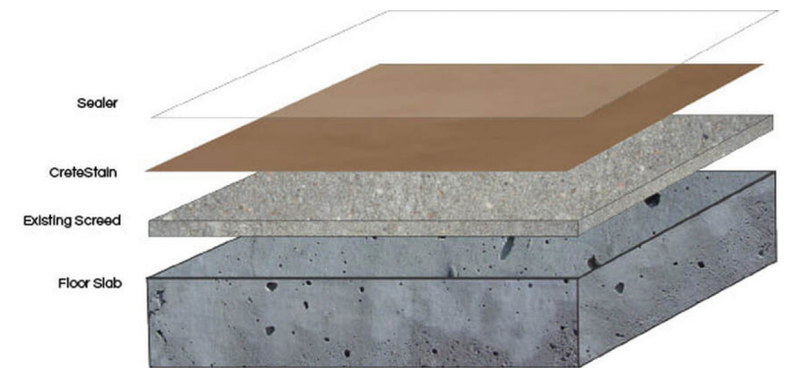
Cemcrete application (cemcrete.co.za, online)
